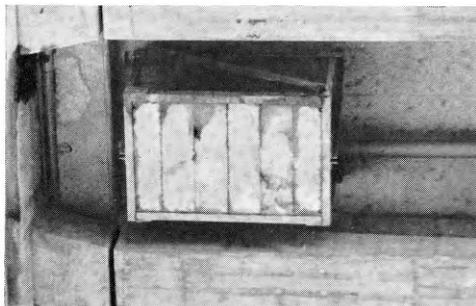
STEEL EXPANSION CHAMBER SUSPENDED BENEATH BRIDGE STRUCTURE
